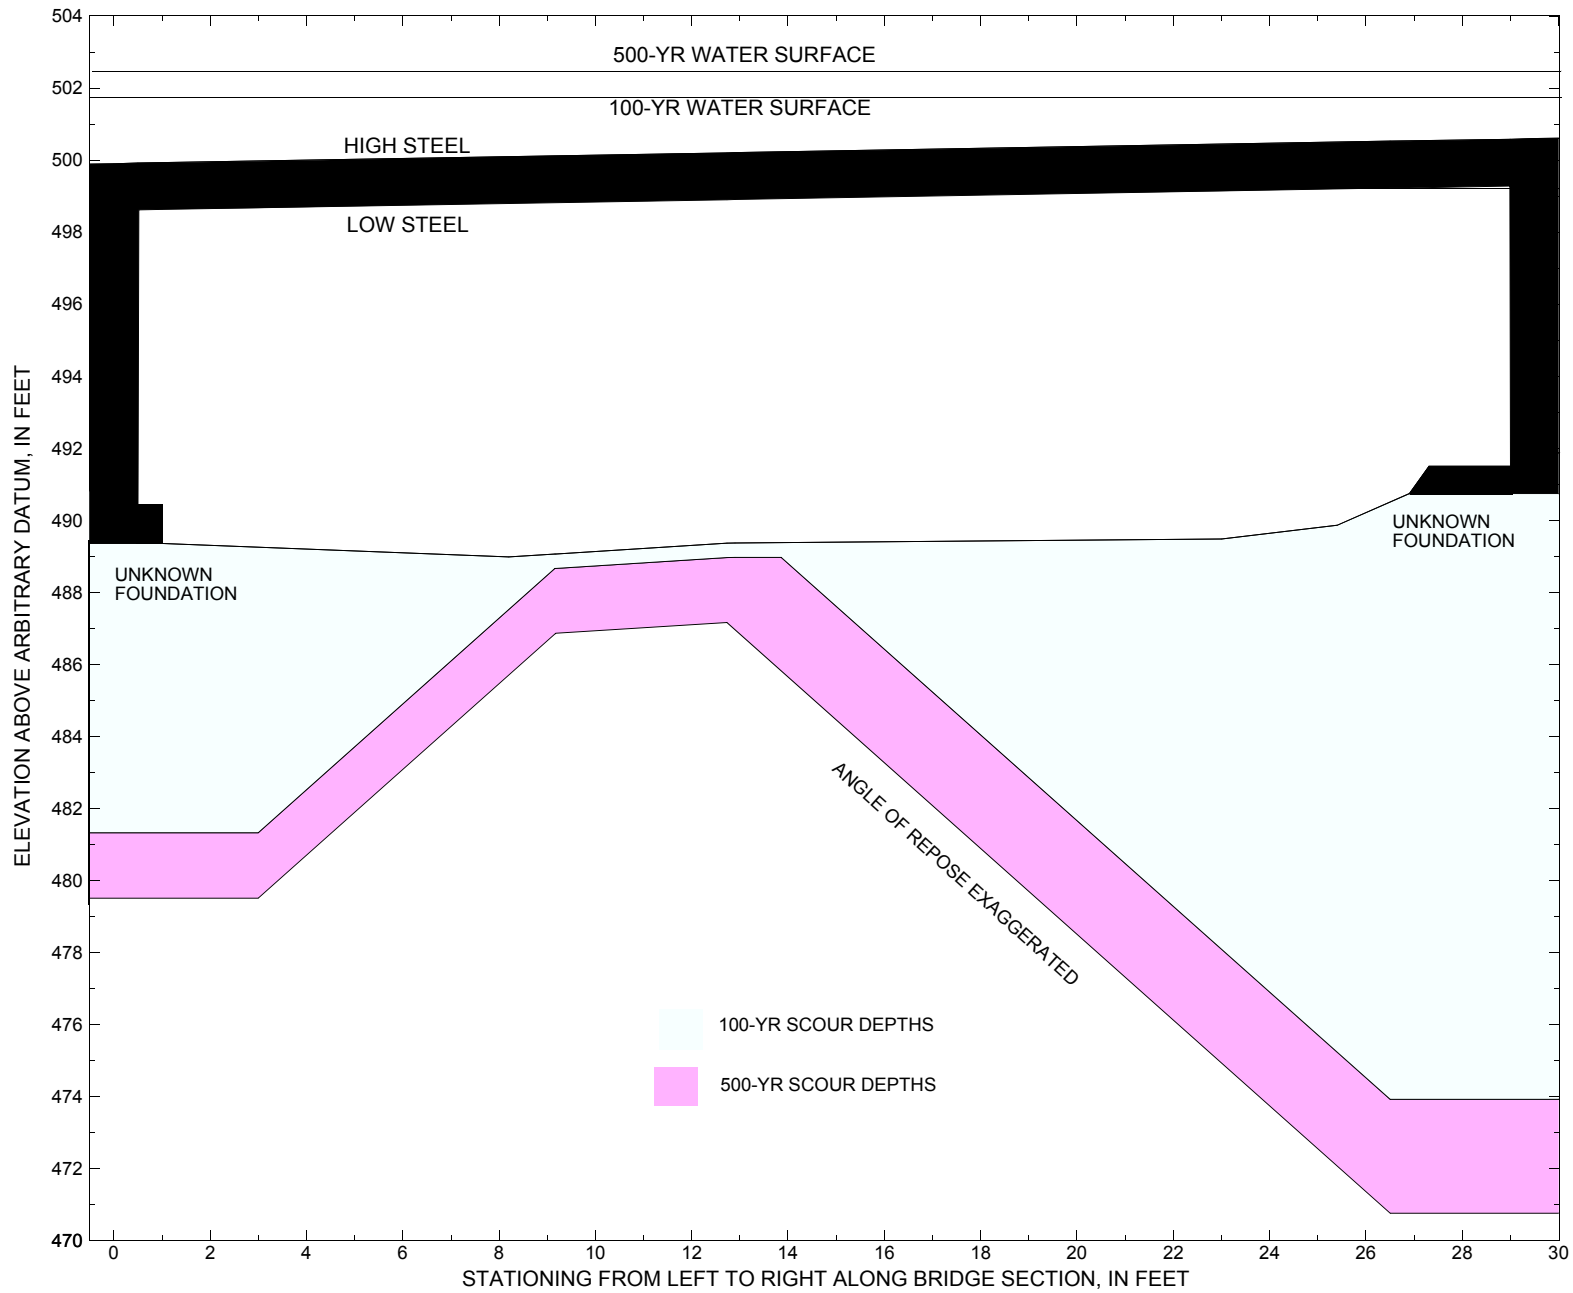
Scour elevations for the 100-yr and 500-yr discharges at structure BRIDTH00490027 on town highway 49, crossing Broad Brook, Bridgewater, Vermont.
